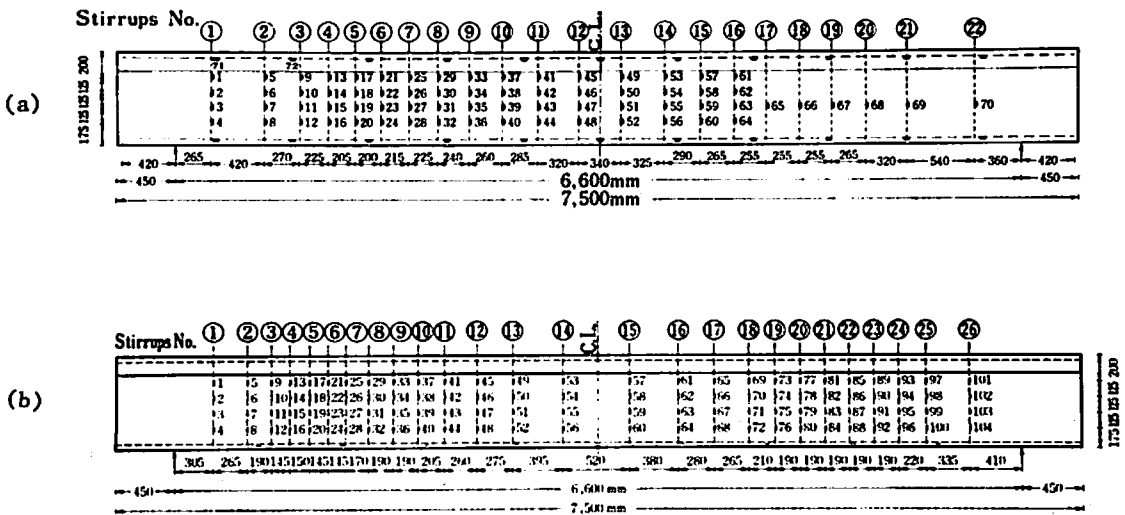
Location of stirrups and positions of strain gauges. (a) the first beam, (b) the second beam.
